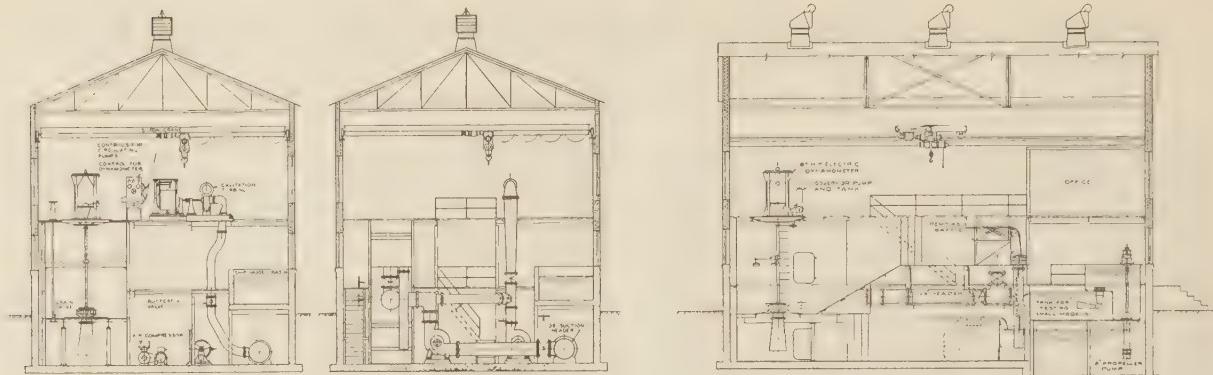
SECTIONAL ELEVATION OF THE HYDRAULIC LABORATORY OF THE NEWPORT NEWS SHIPBUILDING AND DRY DOCK COMPANY AT NEWPORT NEWS, VA.
